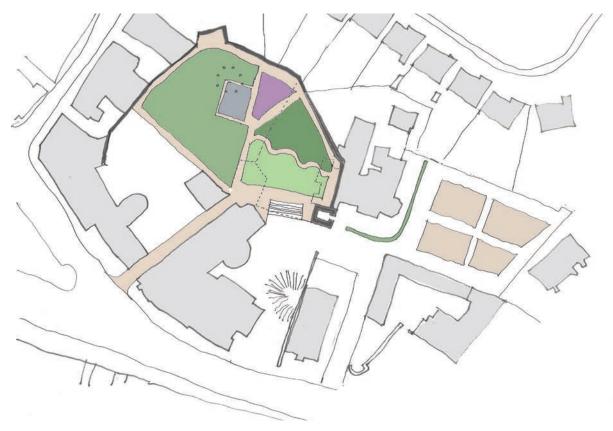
Proposed new park on castle site to provide improved setting for walls and gatehouse.
